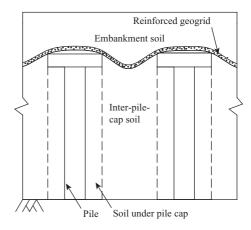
Deformation of pile-supported and geogridreinforced composite foundation
